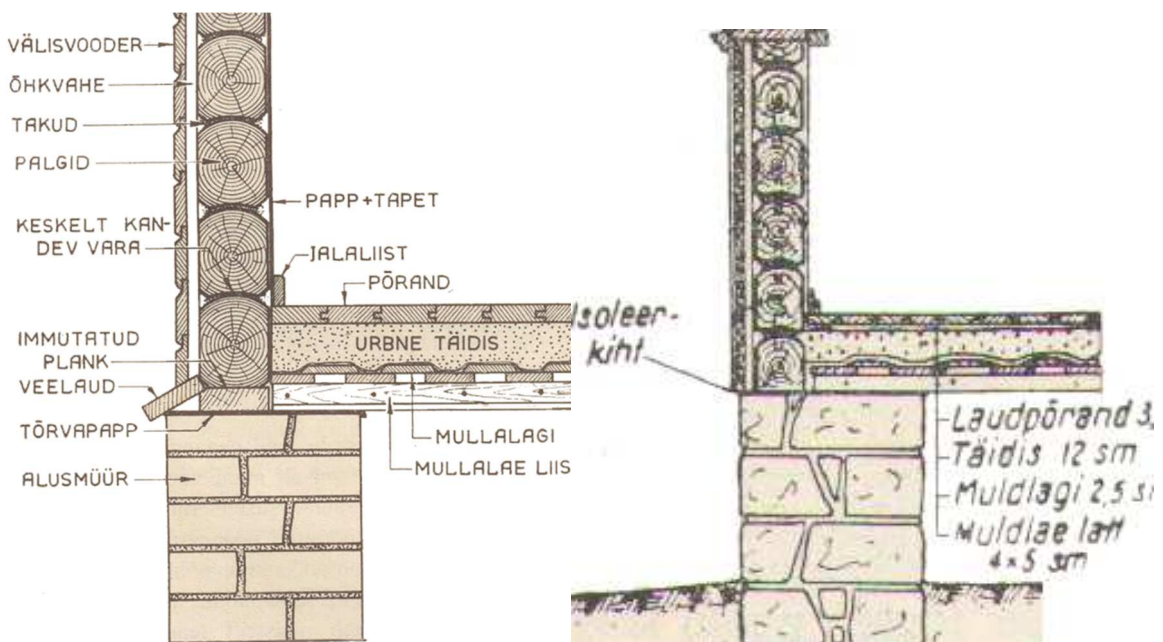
Connection of the external wall, foundation and base floor of studied wooden apartment buildings.
